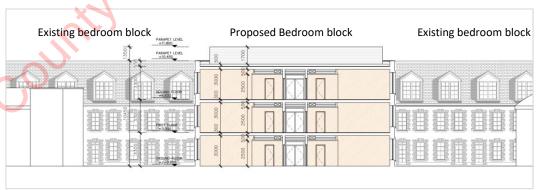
Section through of proposed Bedroom Block showing existing bedroom block behind.
